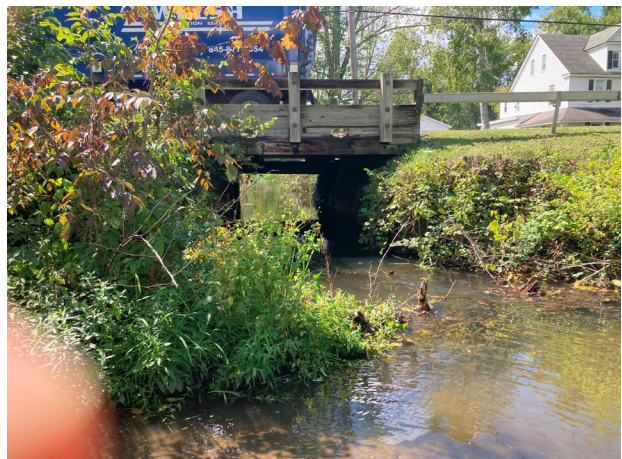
Downstream of ETEUSMS on 9/11/23, view of Mechanic Street bridge
